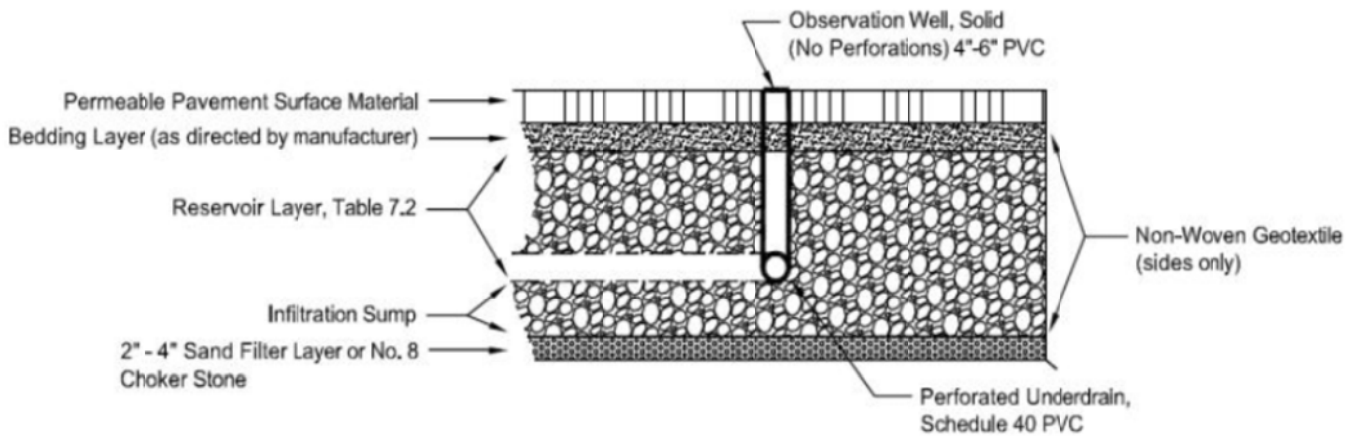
Typical Section Permeable Pavement Level 2 with Infiltration Sump (Source: VADEQ, 2013)
